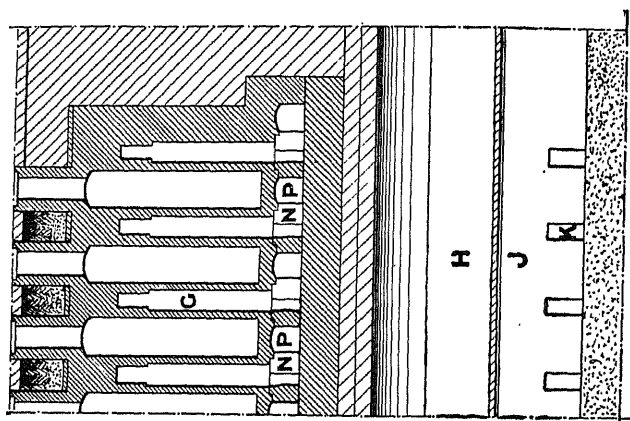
Cross-Section through Ovens and Air Conduit.
